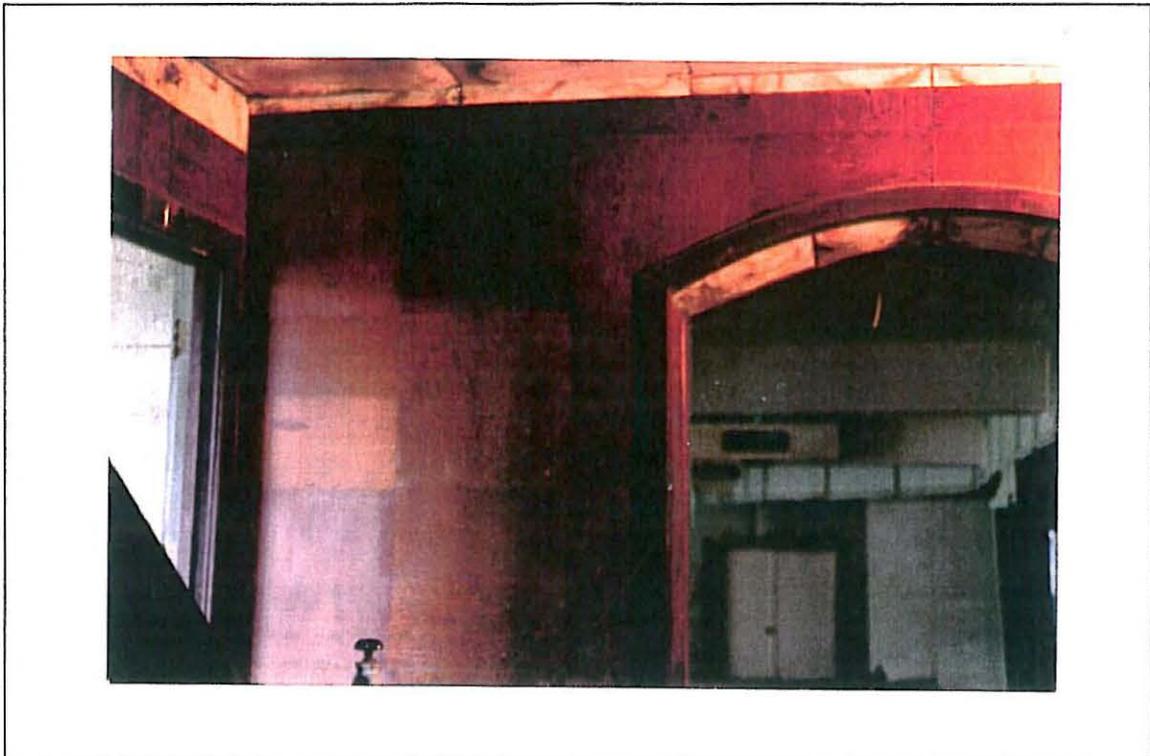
Room 100, SE Corner Ceiling showing buckled fiberboard tile and water damage
